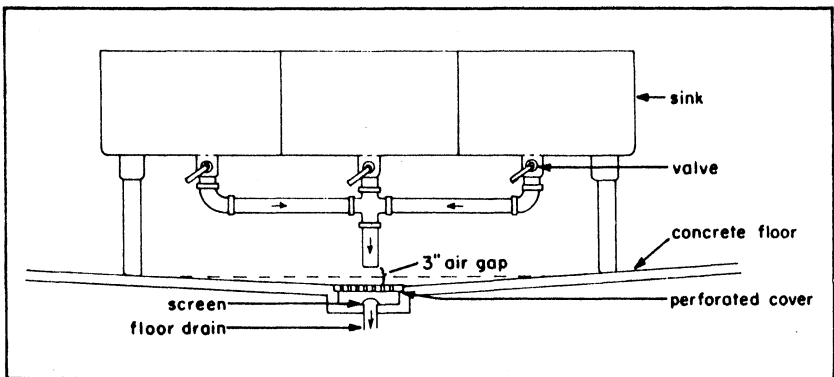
Sink located over a floor drain with air-gap between sink drain pipe and the floor drain.
